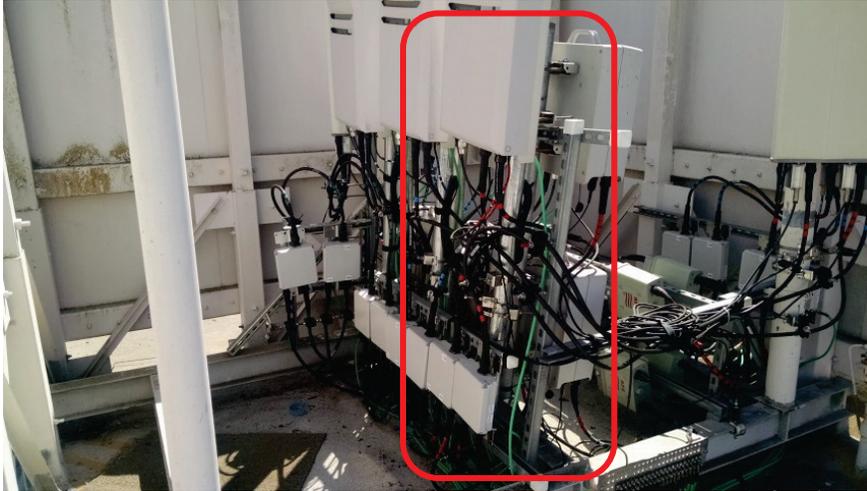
Telephone rack on cantilevered supporting frame at roof of BLD-01650 severely out of plumb.
